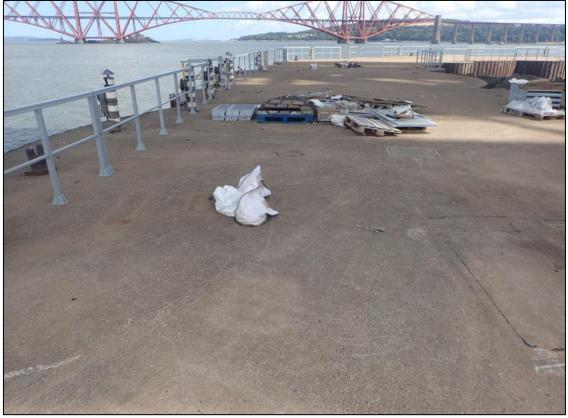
The Forth Road Bridge (South Pier pierhead). Source: BEAR Scotland.
